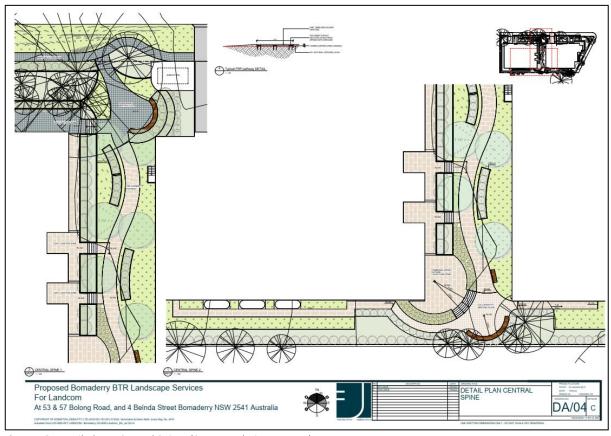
Detail Plan – Central Spine. (Source: Edmiston Jones)
